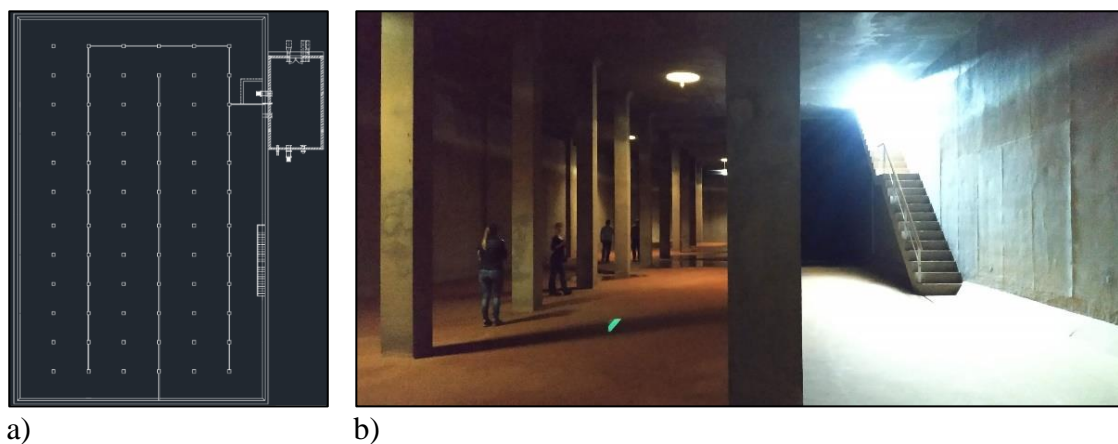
Baffles in rectangular cross-section water storage tanks: a) simplified plant; b) interior view.
